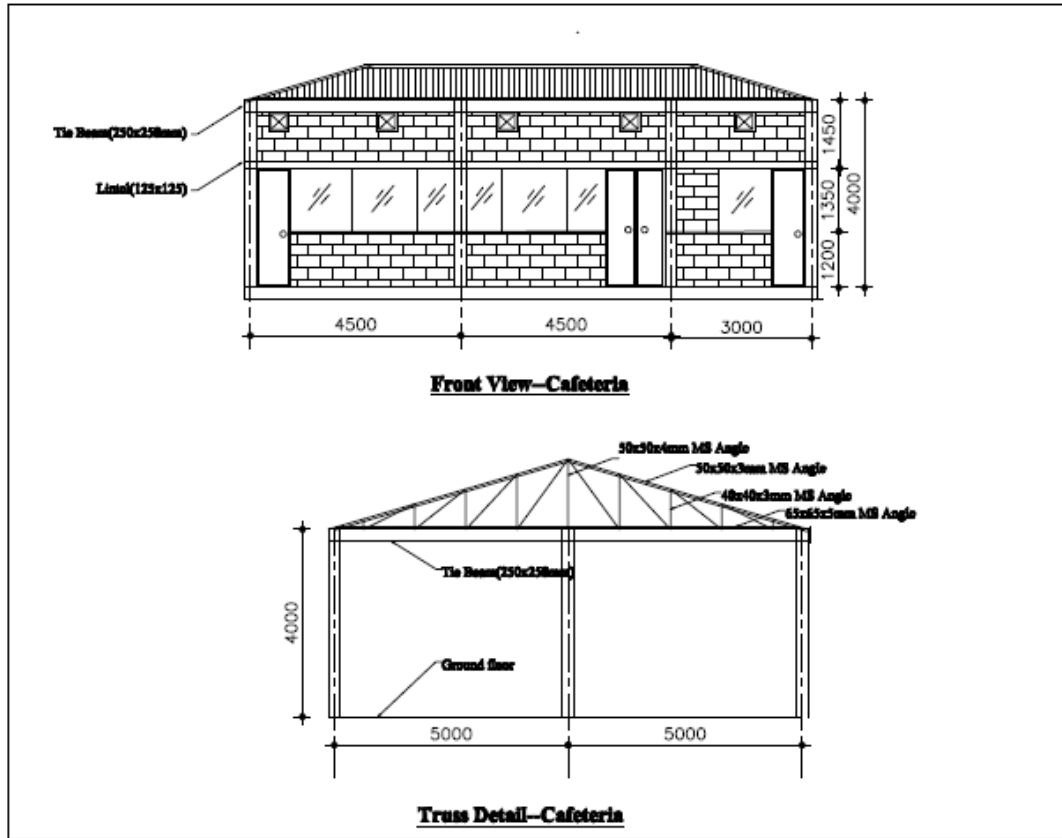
Front View and Truss Details of Proposed Tin Shed Cafeteria
